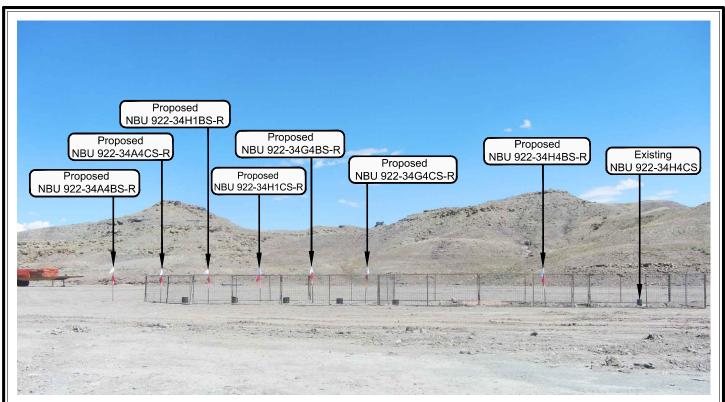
PHOTO VIEW: FROM LOCATION STAKE TO CORNER #1
